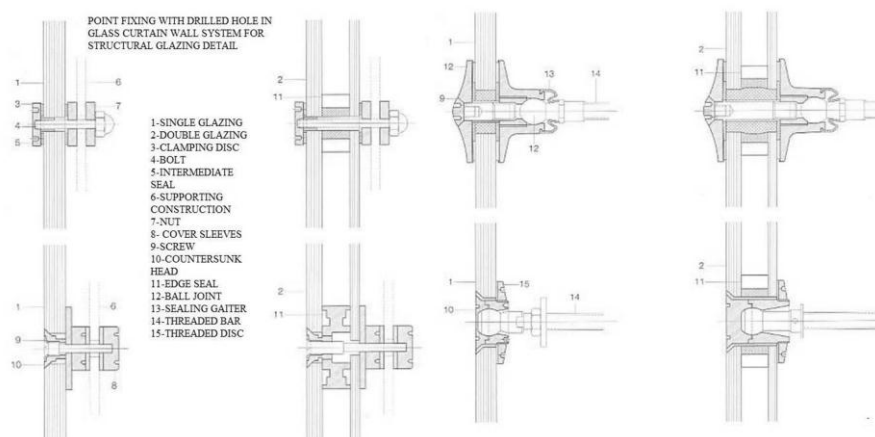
Clamping Detail Designs for Structural Glazing Curtain Wall Type (Schittich, et al, 1999).
